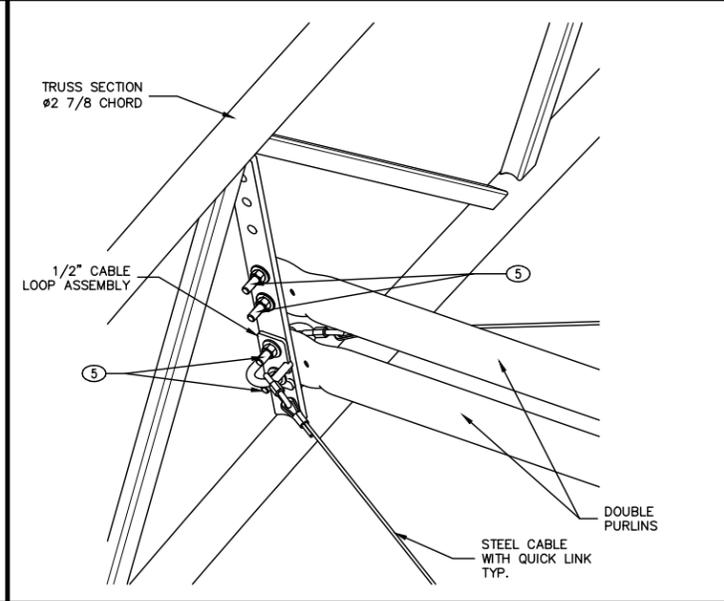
STEEL LEG MOUNT - GRIDS 1 & 7 ONLY
